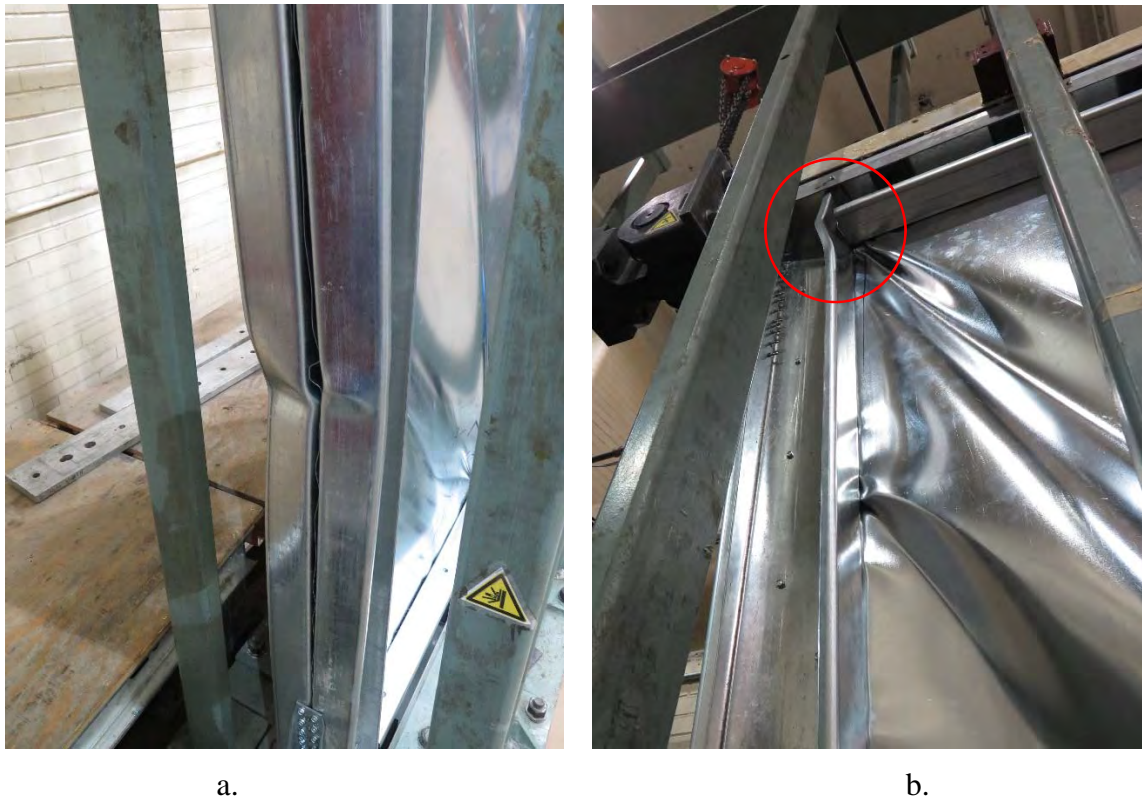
Damage in chord studs of specimen W18-M: a. axial compression load and bending moment interaction failure in the vertical chord studs and b. local damage of the chord stud flanges due to contact with the horizontal framing members at corners
